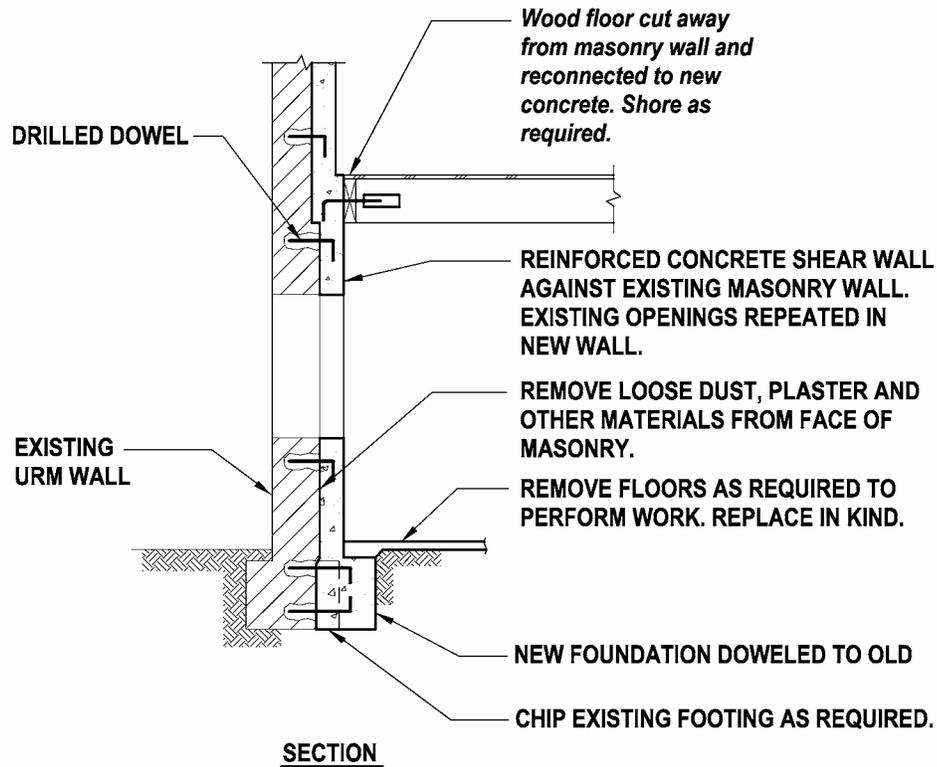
Concrete or Shotcrete Wall Overlay
